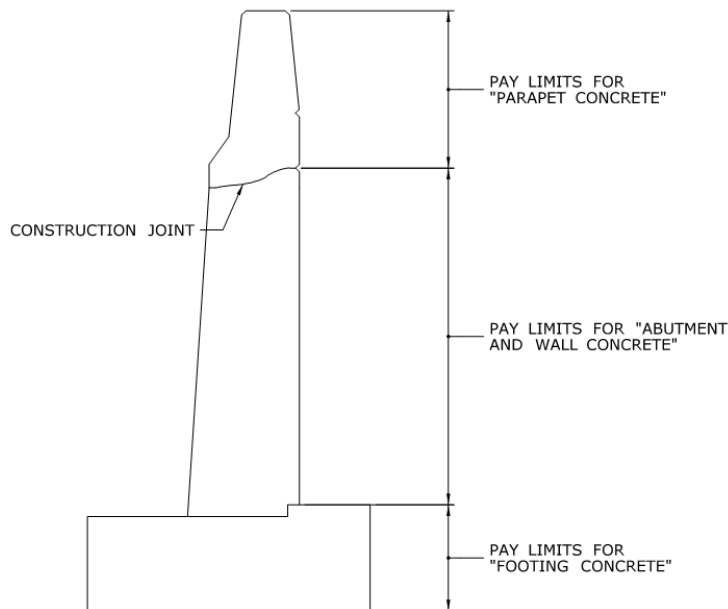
FIGURE – CONCRETE WALL WITH PARAPET PAY LIMITS
